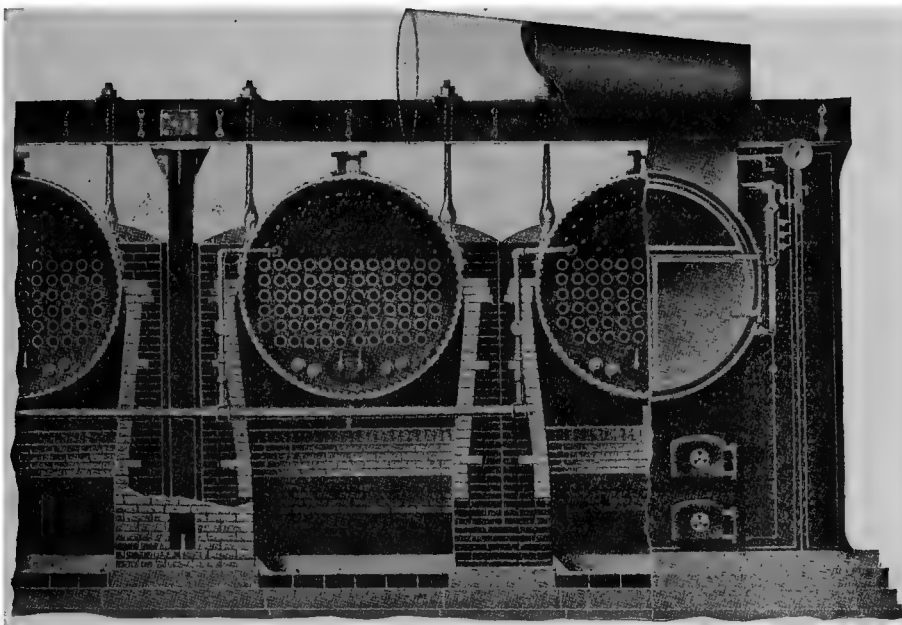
Front Elevation and Partial Section of Suspended Boilers.
